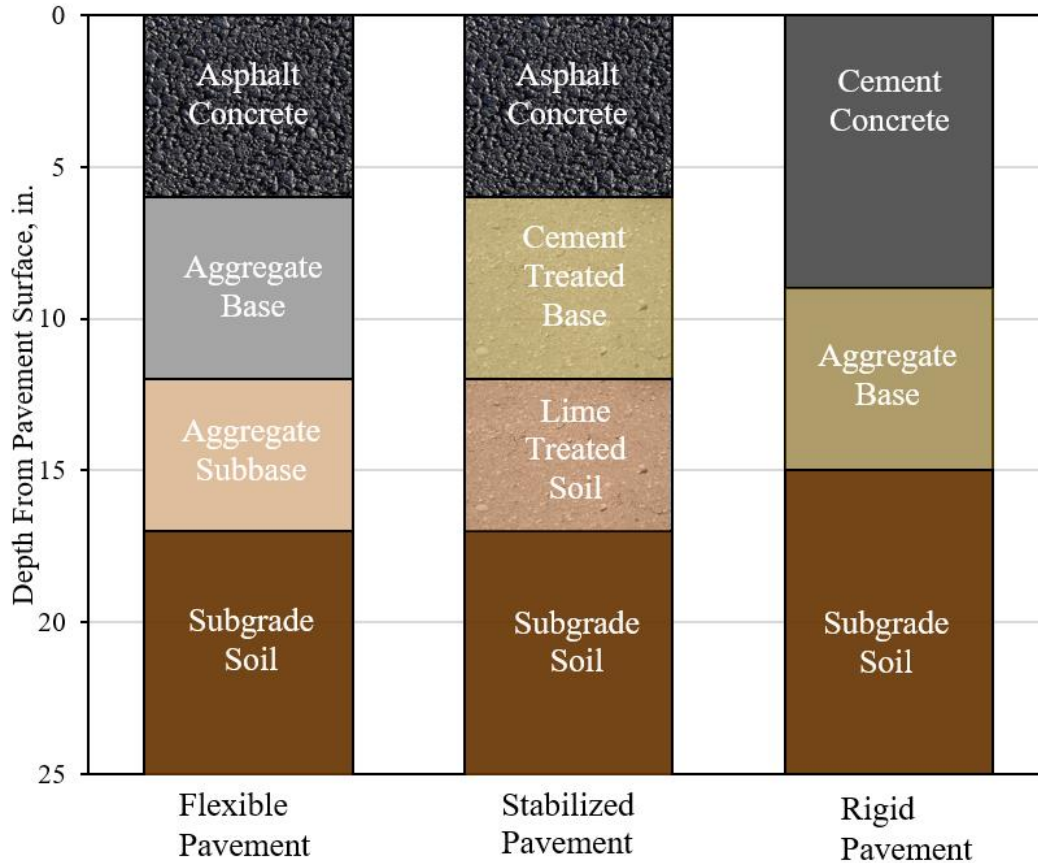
Typical Cross Section for Flexible, Rigid, and Stabilized Pavements.
